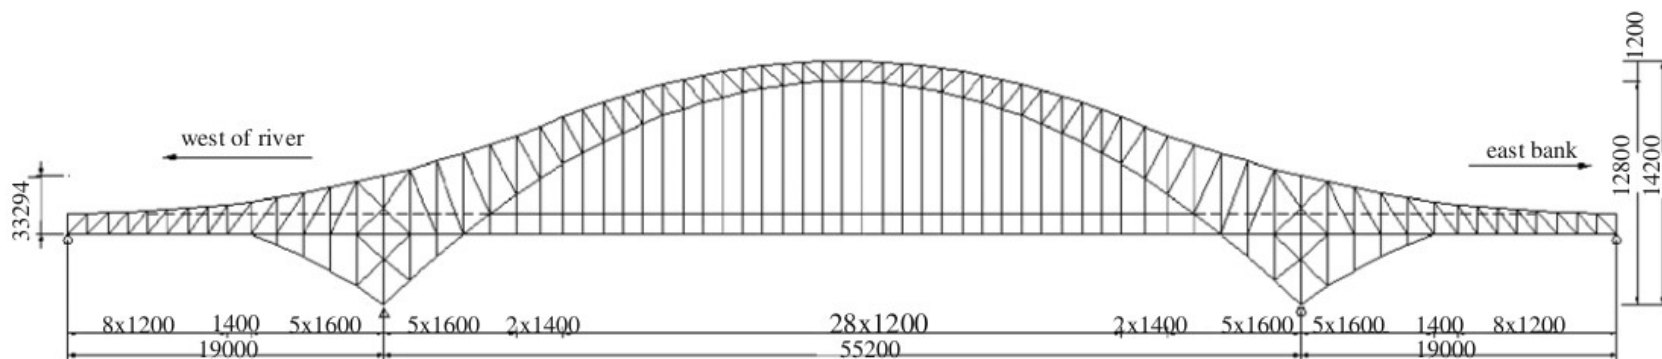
Elevation view of Chaotianmen Bridge (Unit: mm).
